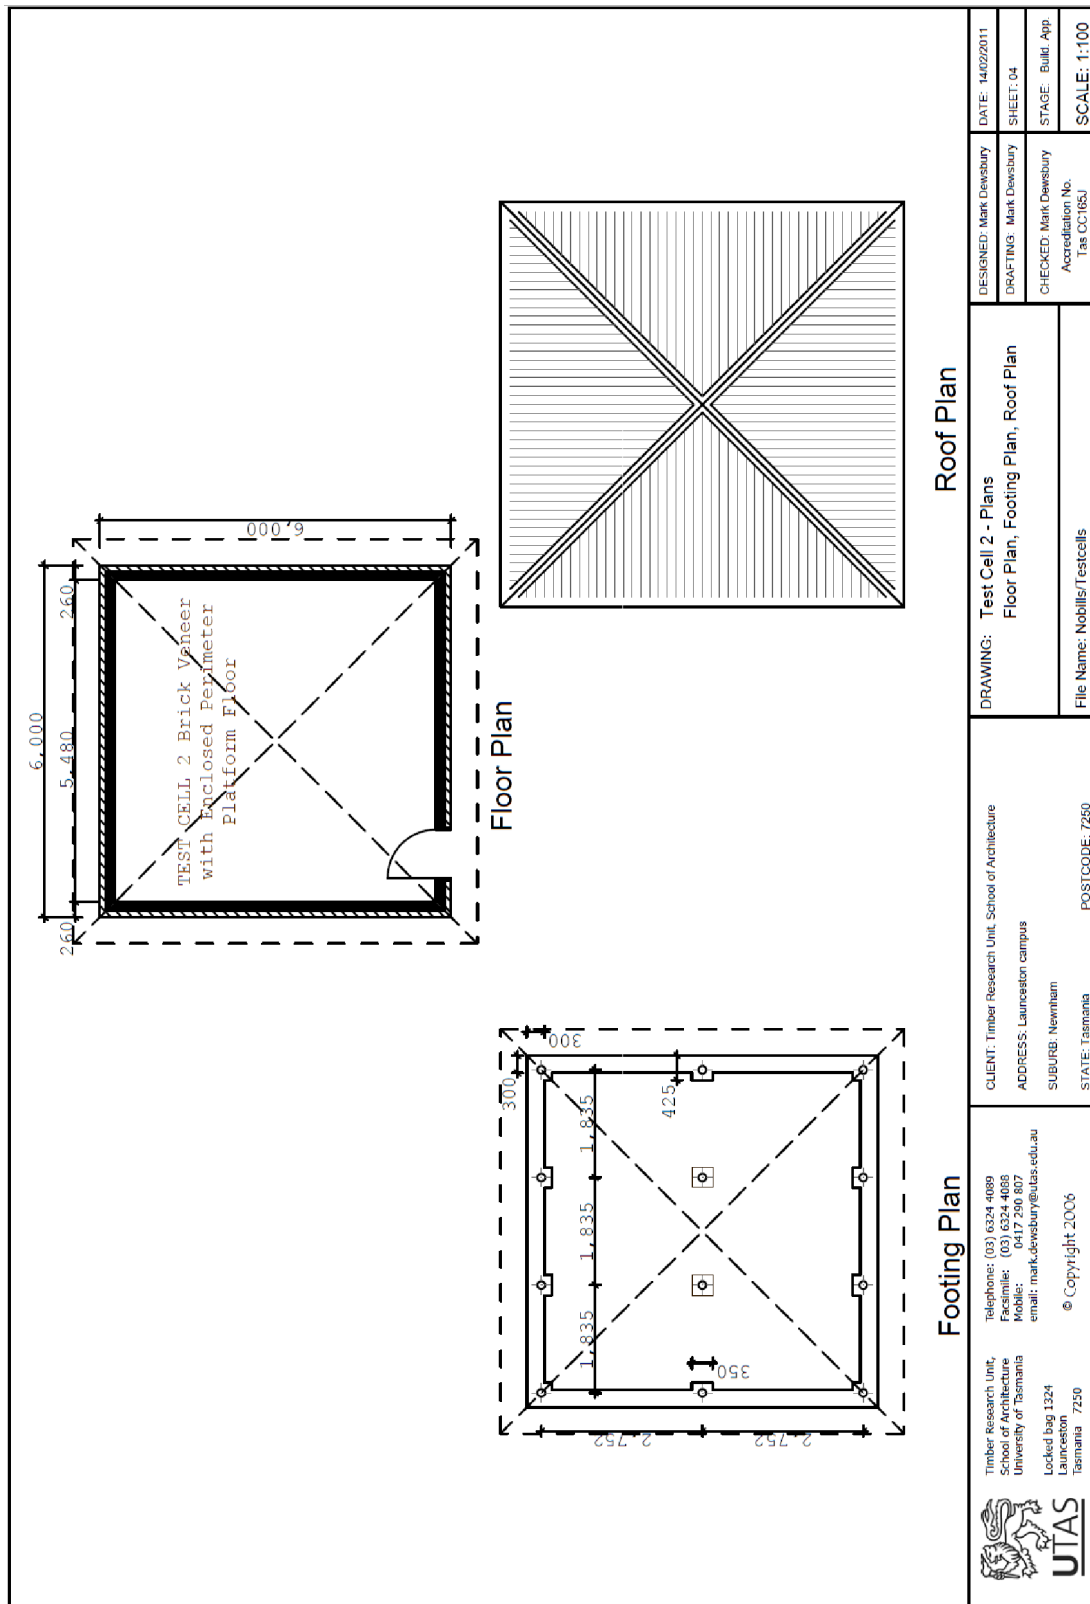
Test Cell 2 Footing Plan, Floor Plan and Roof Plan (not to scale)
